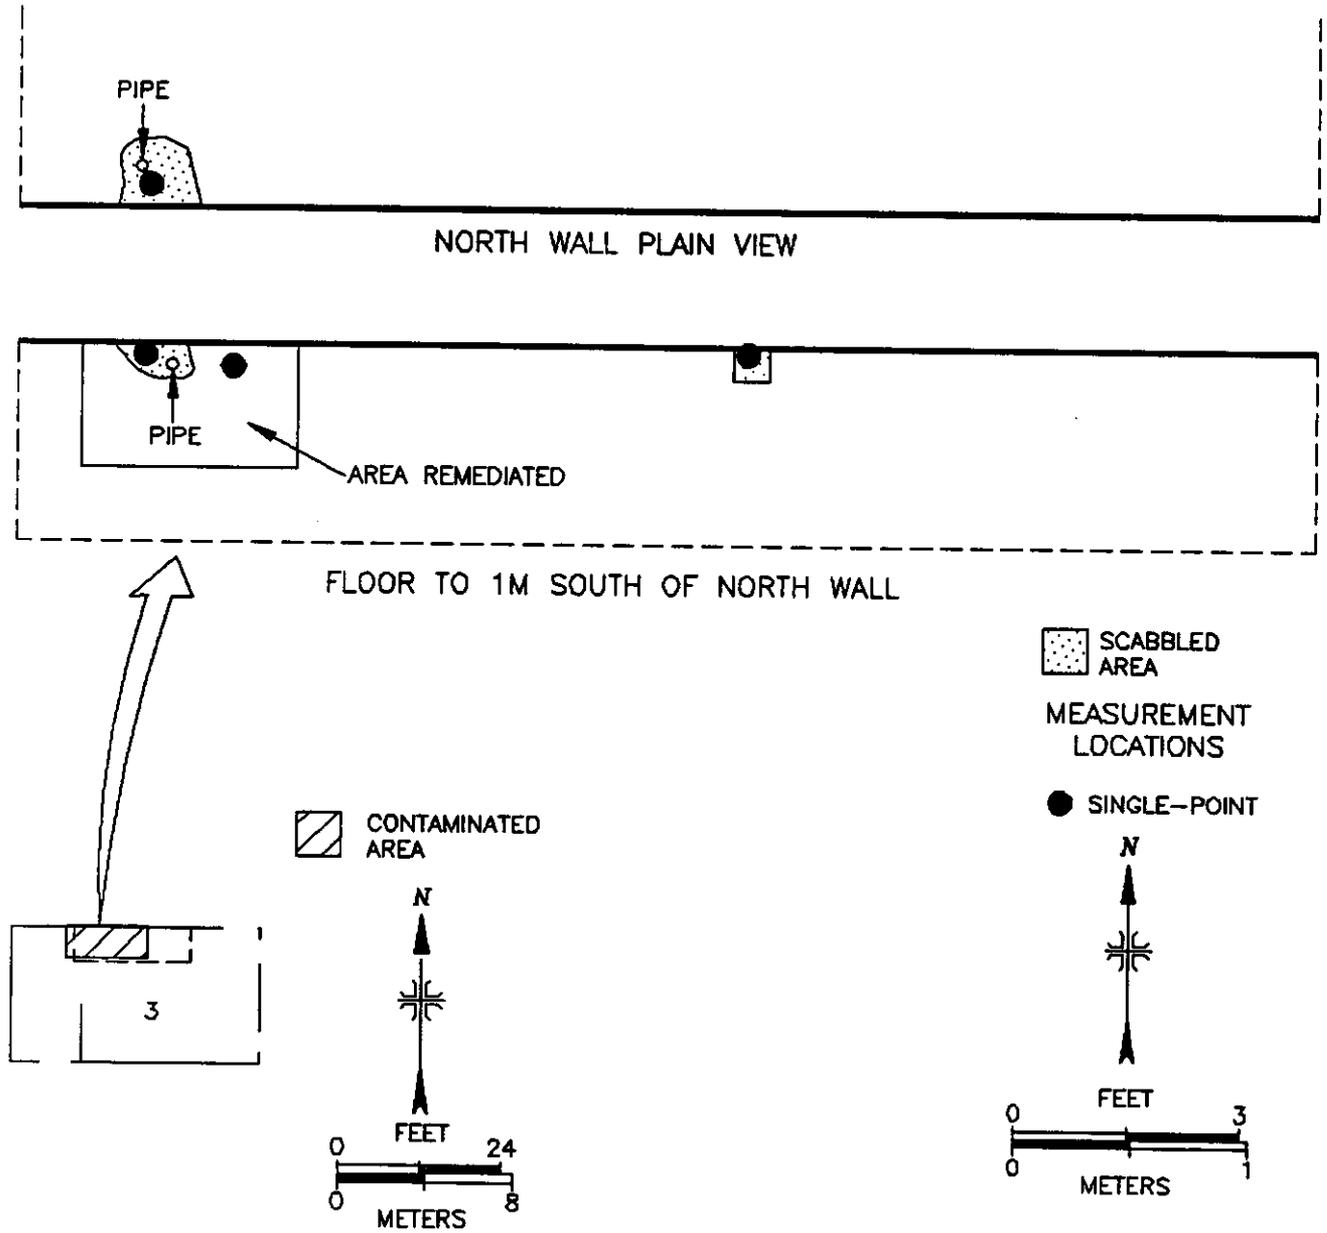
Building 28, Room 3, Indicating Measurement Locations on the Floor and North Wall
